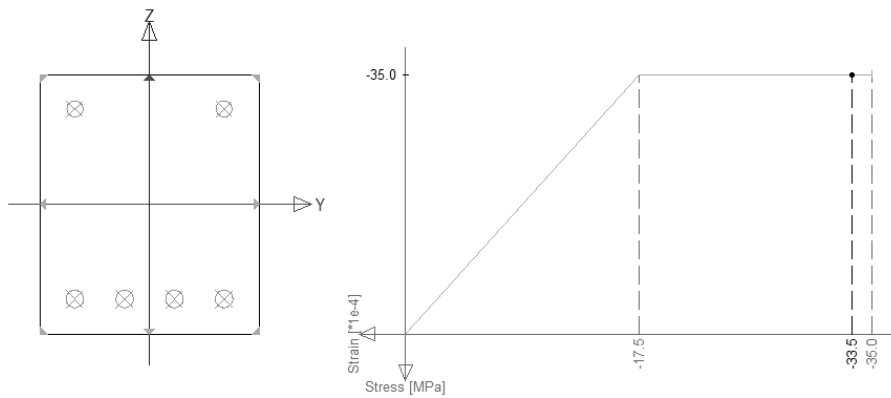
Concrete Stress - strain relation within concrete compressive zone of the cross-section at mid-span
